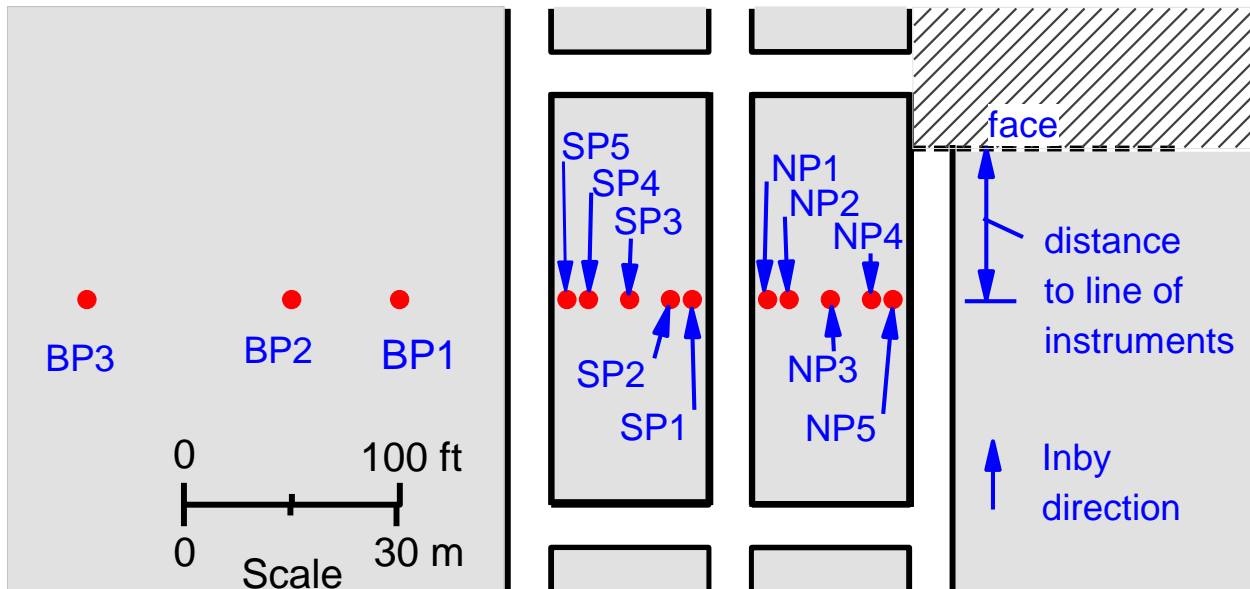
Plan view of 1 North pillars and barrier pillar at outby site with locations of borehole pressure cells.
